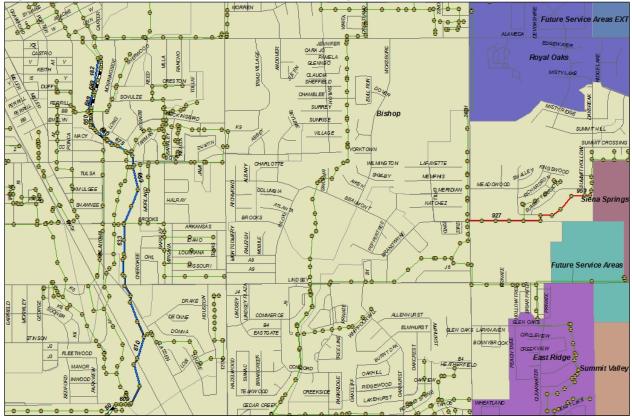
B. Bishop Sewer Basin Proposed Piping Improvements
